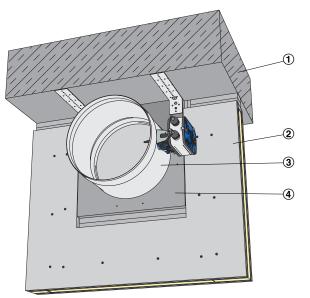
Installation into lightweight partition wall with flexible ceiling joint, using dry mortarless installation kit GL
